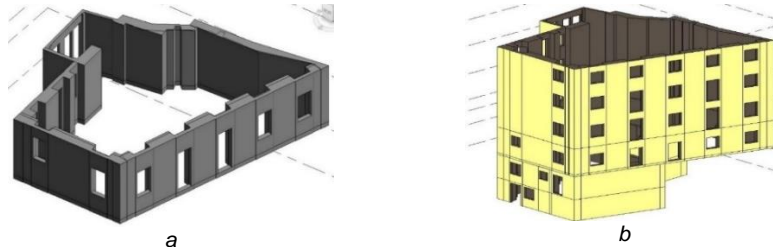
Modulation of a single floor (ground level) (a) of the facade walls completed (b)
